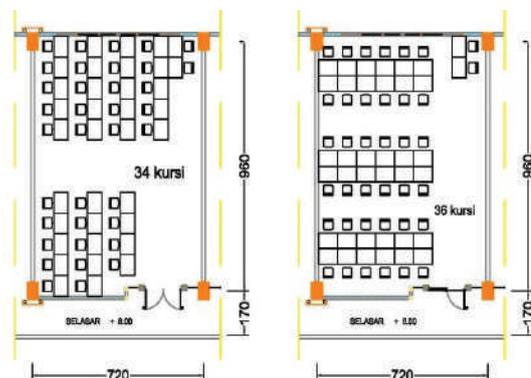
305 Classroom (Left) and 101 Classroom Existing Layout
